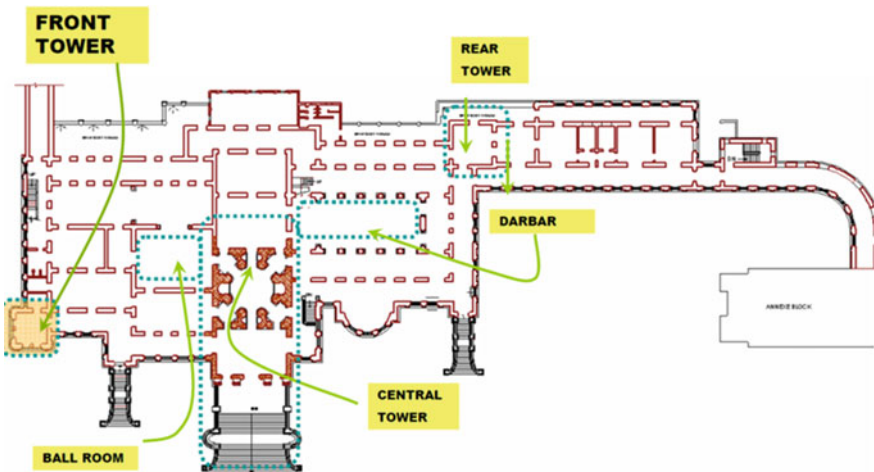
Ground-floor plan view of Ujjayanta Palace
